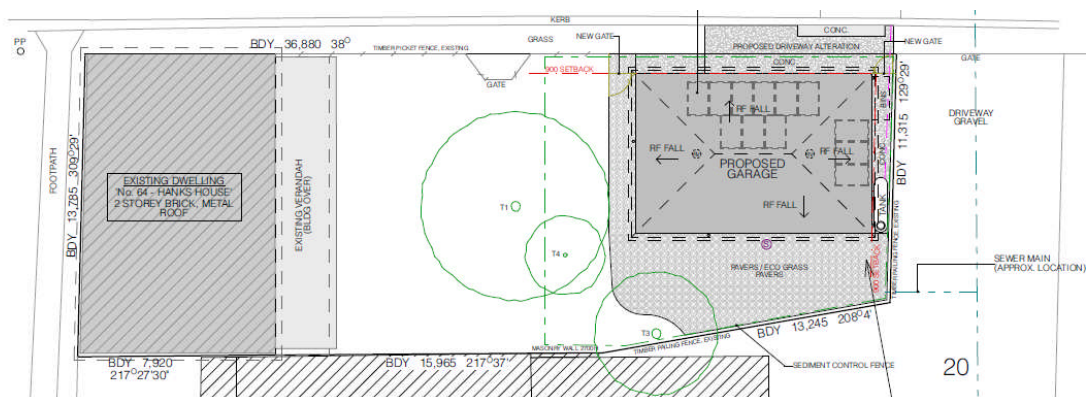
Site Plan showing the existing house and new Garage. (Dwell Building Design)
